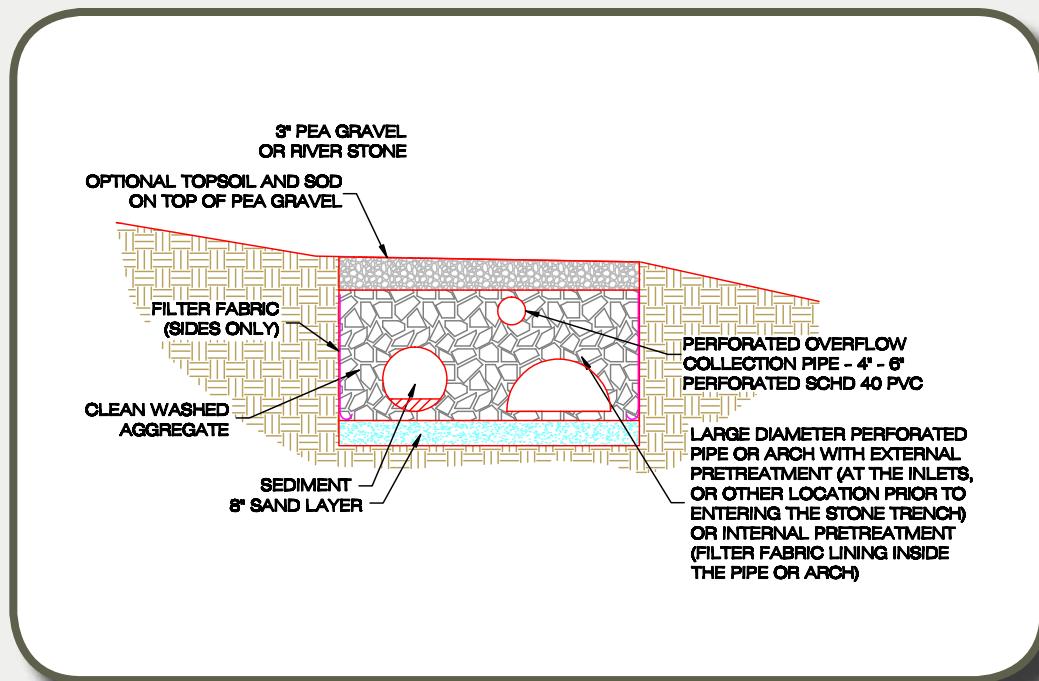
Infiltration Section with Supplemental Pipe Storage and Overflow Pipe
